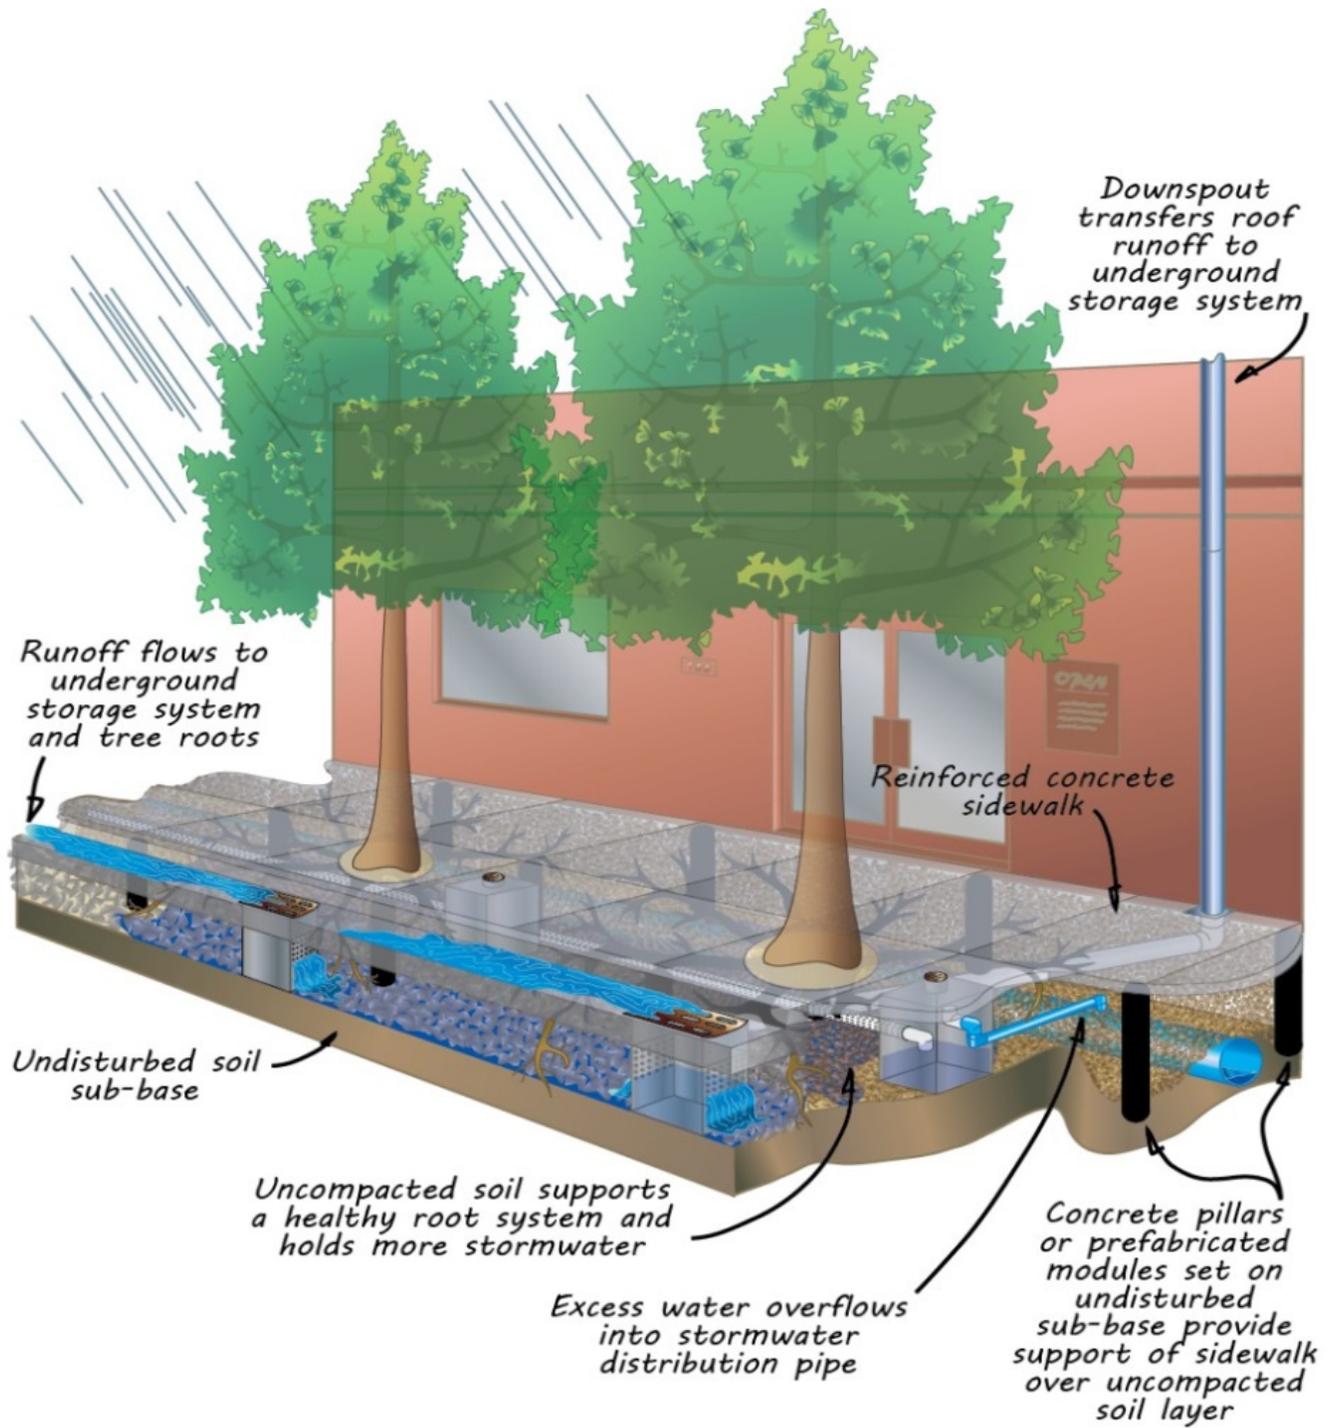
Suspended sidewalks use pillars or structured cell systems to support reinforced concrete, increasing the volume of uncompacted soil in subsurface planting areas and enhancing both root growth and stormwater storage.
